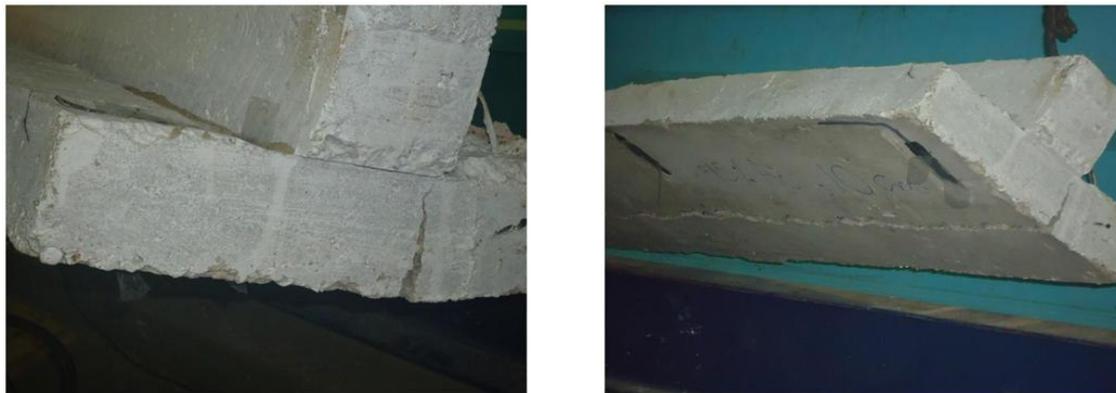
Failure Shape of Rectangular Strip Footing
